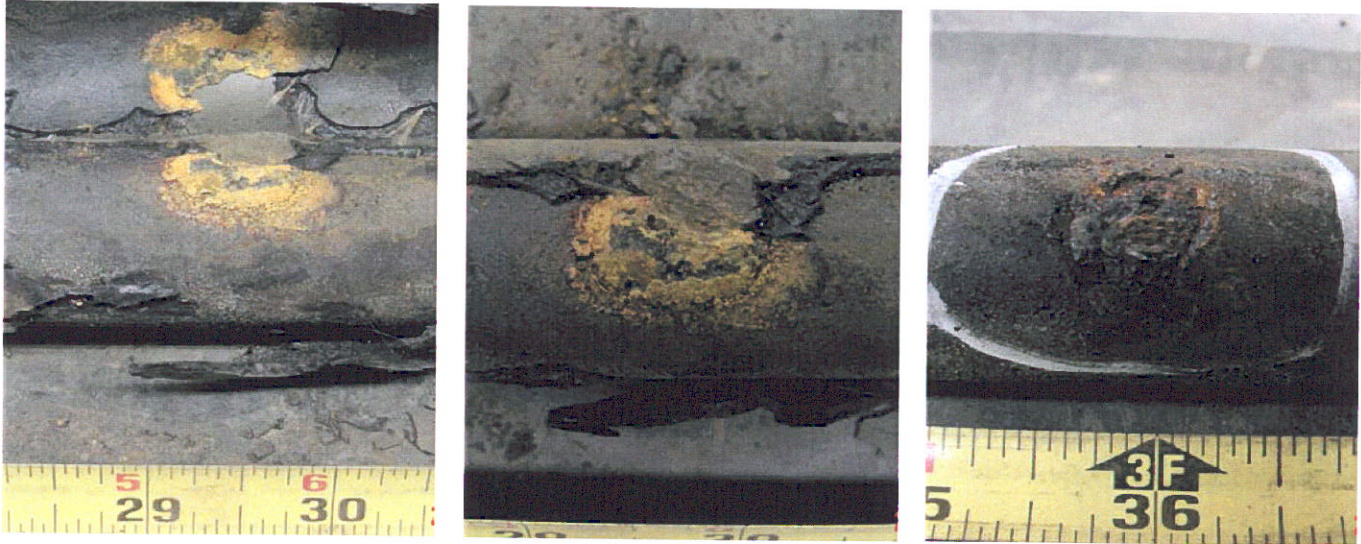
Example of external coating damage removal to expose the underlying steel condition (Segment 9).
